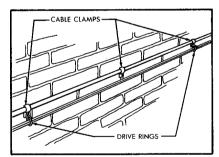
Drive Ring or Bridle Ring Run Paralleling Cable Attached with Cable Clamps
